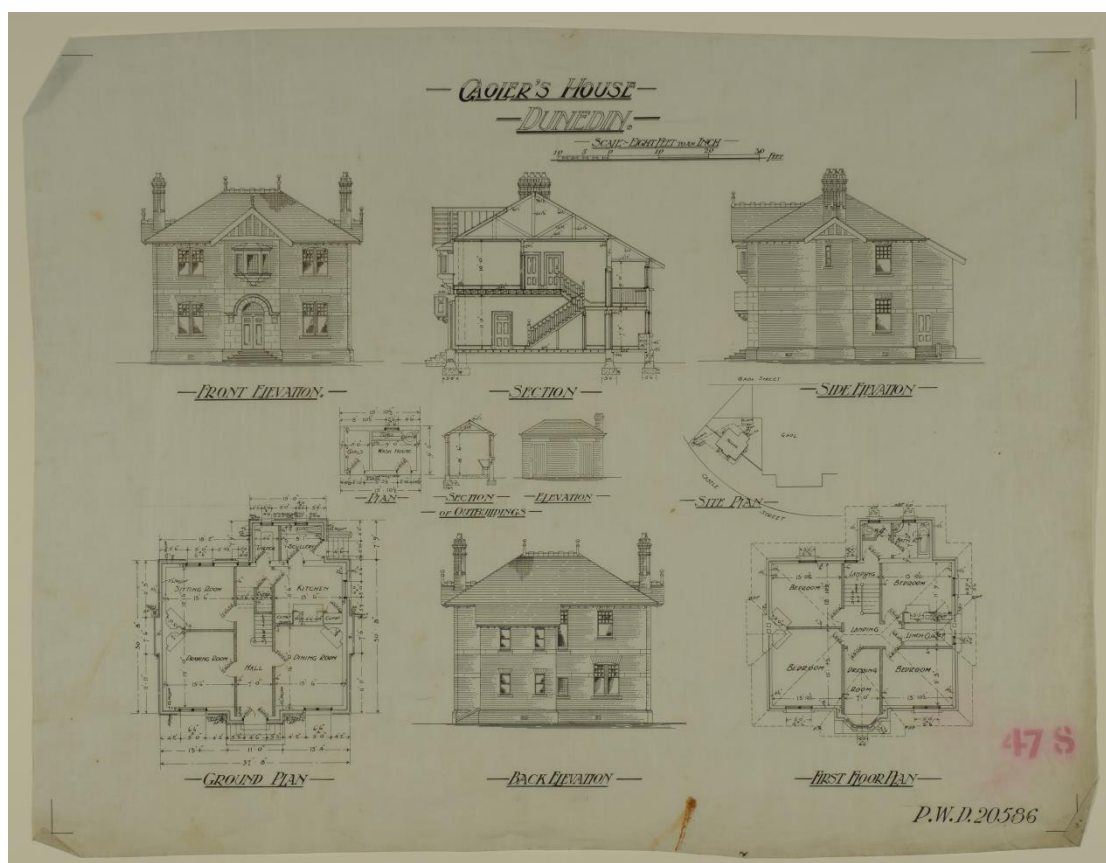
Undated plans, elevations, sections and site plan for a Gaoler's House and outbuilding to be constructed in the yard at the southern end of the Dunedin Prison between Castle Street and Gaol Street. Labelled PWD 20586 and 47S. (Archives NZ ACHL 22541 1187-1302-25086 [sic]_01)
